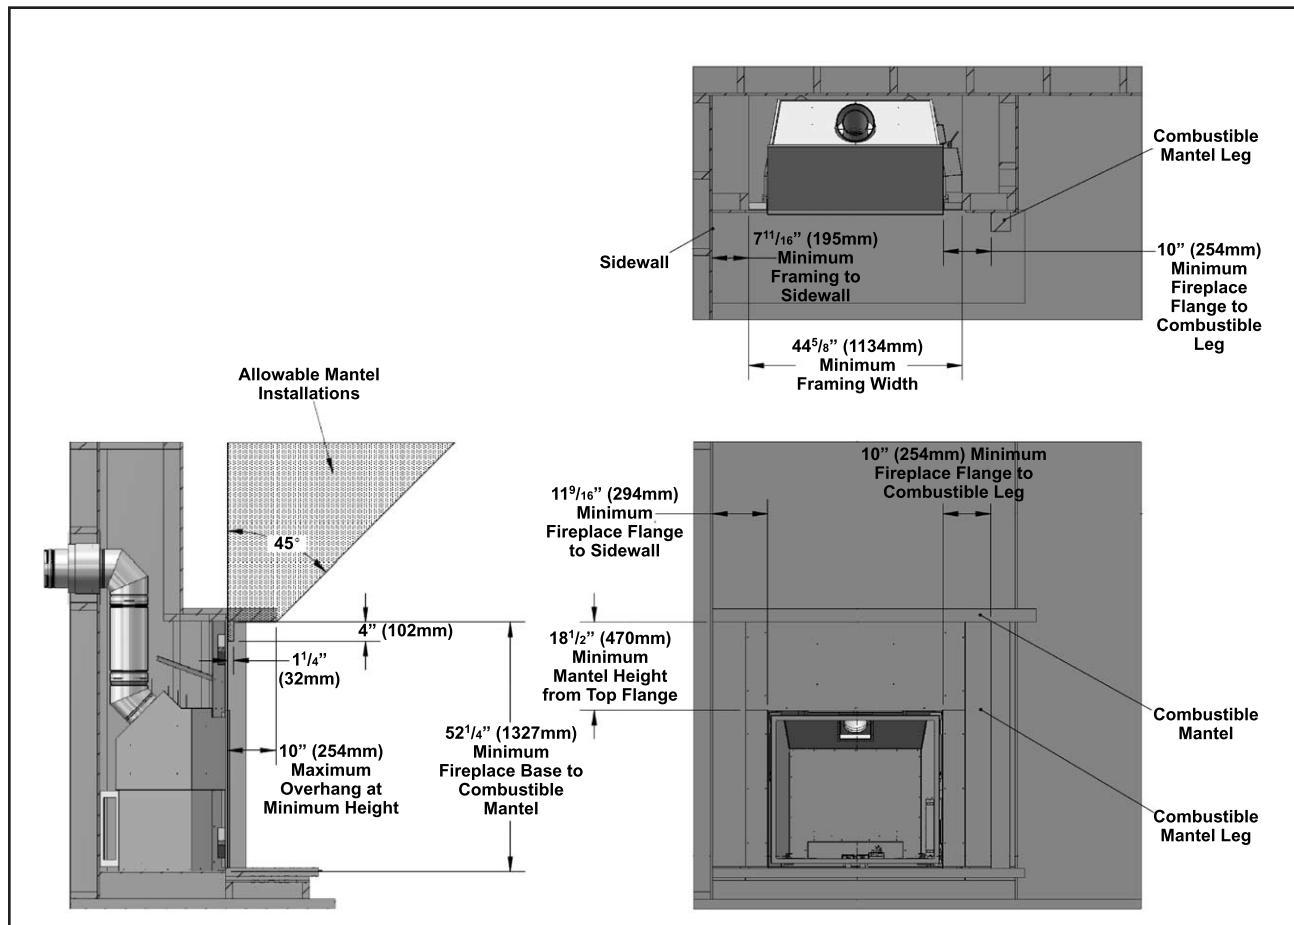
Typical Framing for Sidewalls & Mantel - Detailed.
